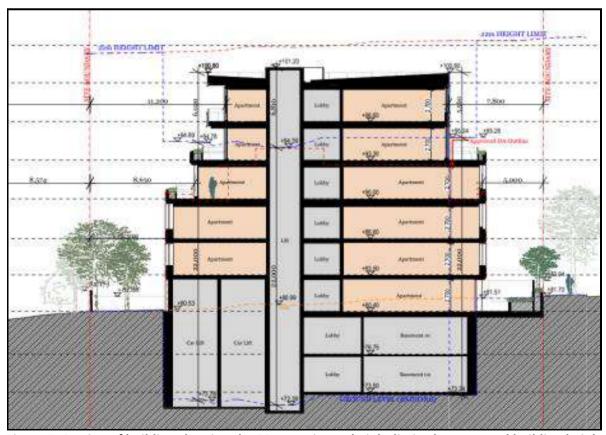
Section of building showing the 22m maximum height limit, the approved building height and proposed building
